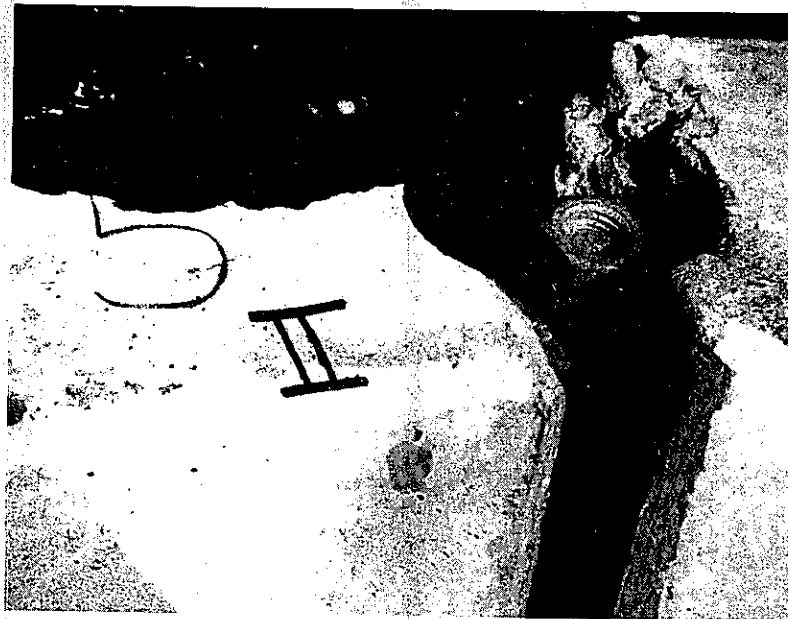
, Probable Bond Failure of Top Hinge Rebar (view of impact side of barrier), Second Joint Downstream from Impact, Test 292
